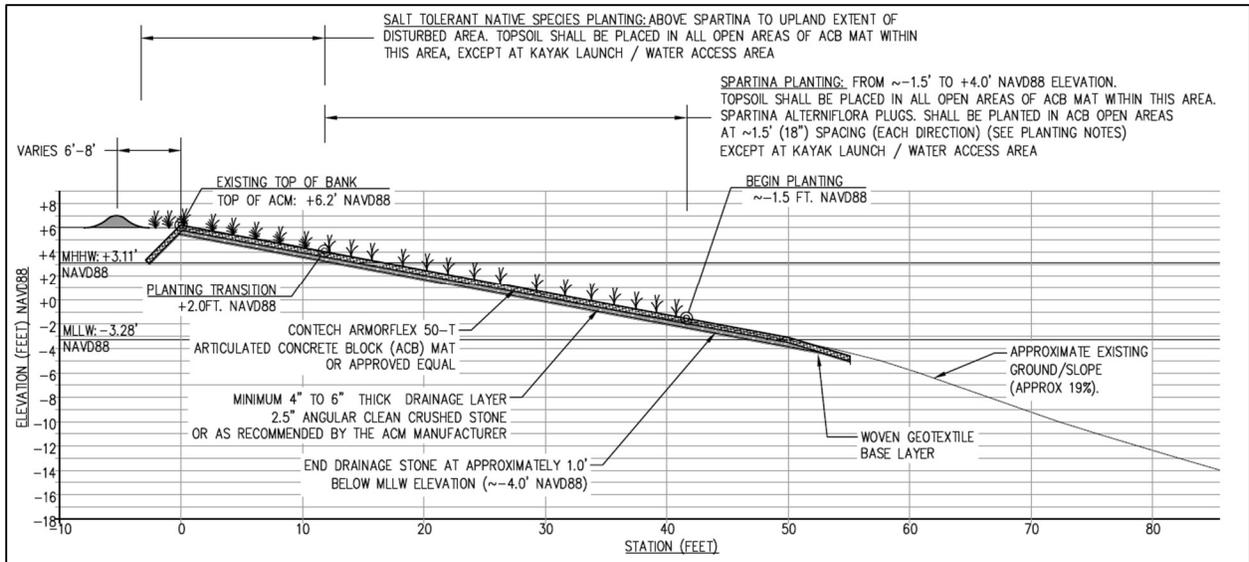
Section view of proposed living shoreline features along the South Point park (Section A-A from Figure 2-3).
